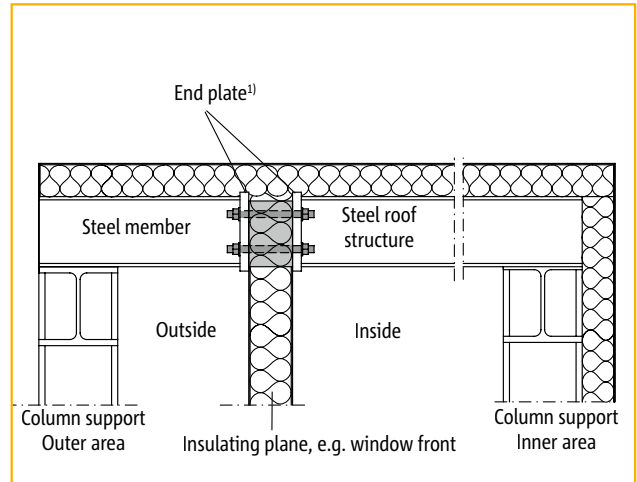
Schöck Isokorb® type KST for separation within the structural system
